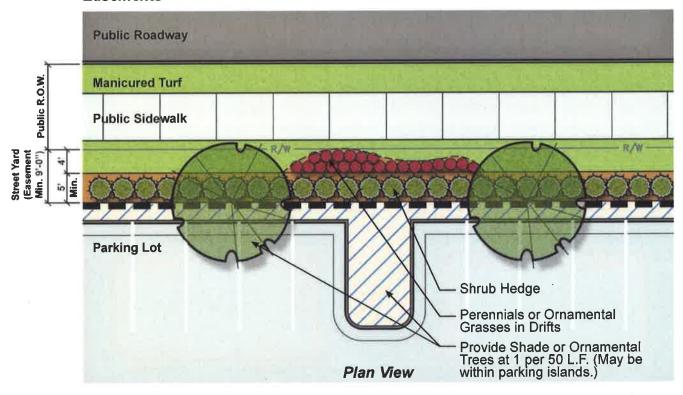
Typical Street Yard Plan and Cross Section - Development Adjacent to 9'-0"
